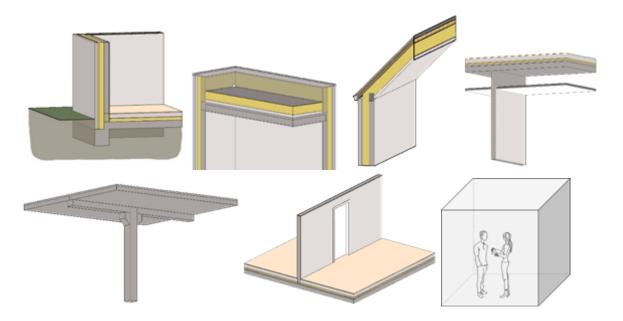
The treated nodes in our first step of research into BIM modelling guidelines: foundation attachment - roof edge flat roof - connection sloping roof and outer wall - connection false ceiling and inner wall - connection column/beam/floor - inner door - space
